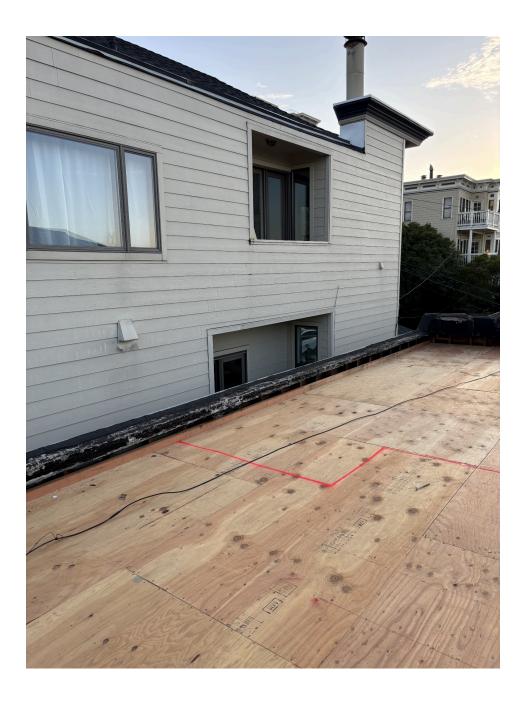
View of roof deck from primary bedroom of 561 Wisconsin St showing the intrusion into city views.
